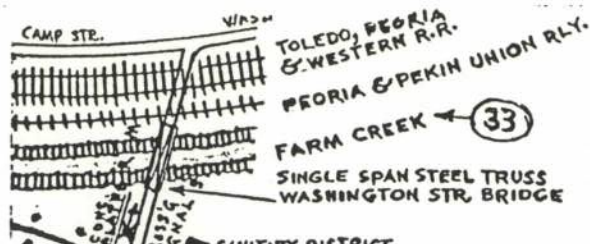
DETAILS OF [EAST] WASHINGTON REFER TO PLATE No. 3.
